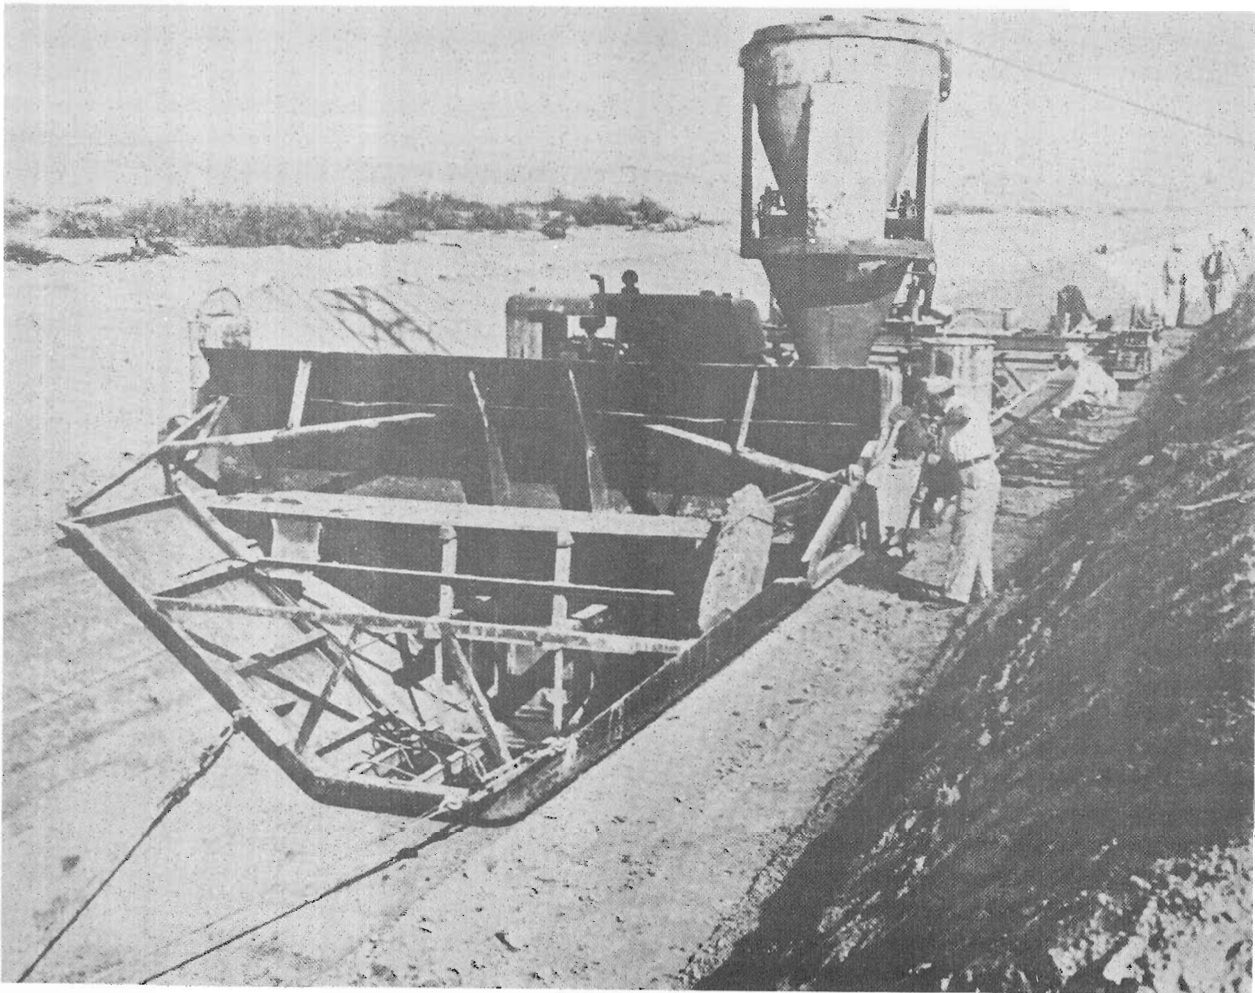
A subgrade-guided slip-form concrete lining machine following an excavator. PX-D-32056.
